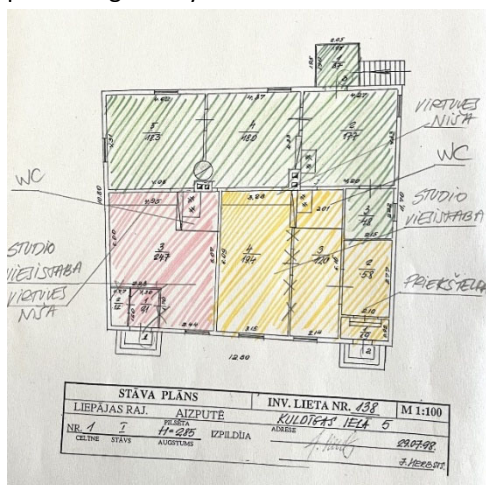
Building plan, complimented with hand sketches showing intended zoning of the building. Sketch of the owner.
